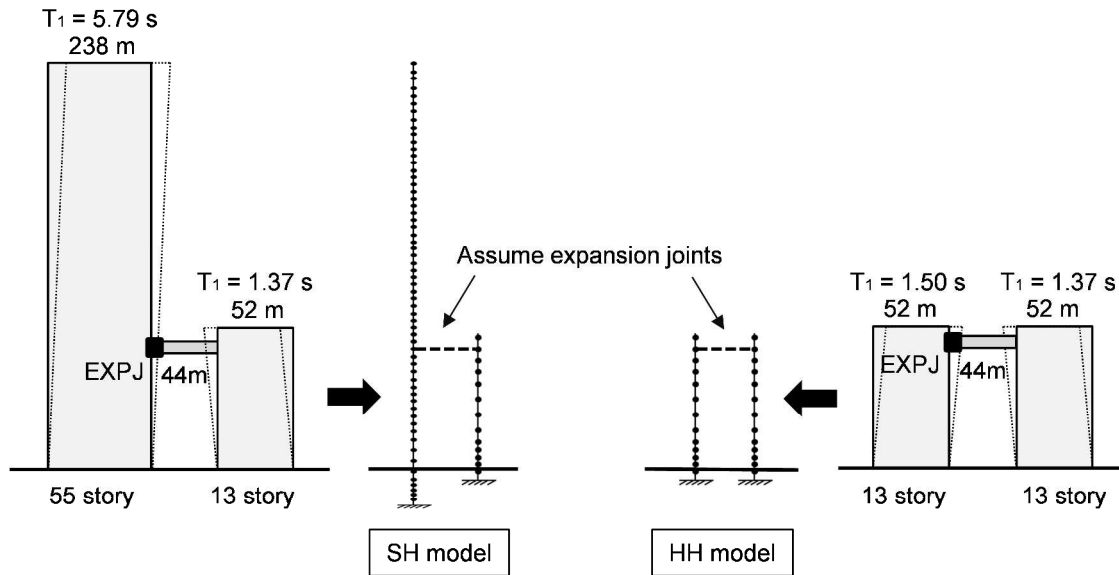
Adjacent building models where expansion joints were assumed at a height of 44 m
